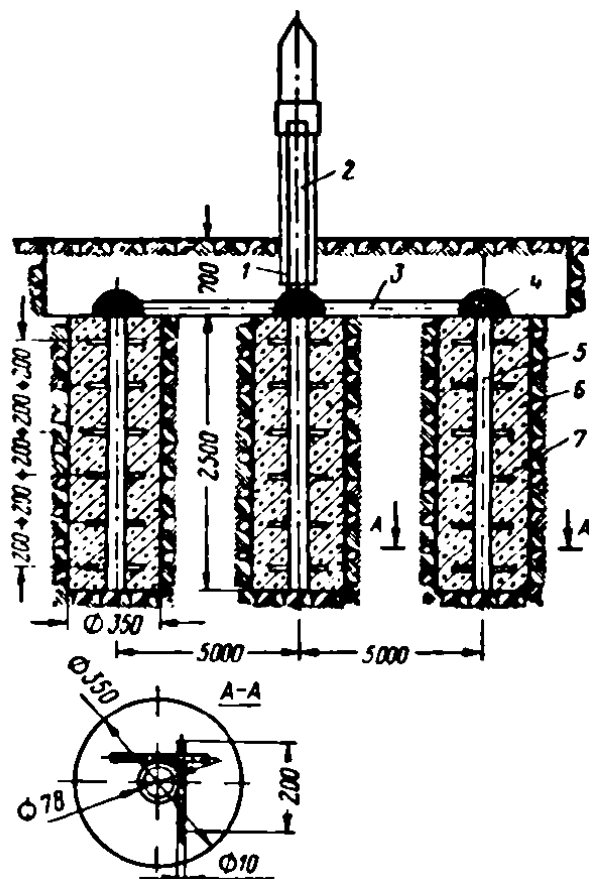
Combined anode ground electrode: 1 - contact output. 2 - reinforced concrete column; 3 - connecting bus; 4 - bituminous filling of the welded joint; 5 - Earthing electrode; 6 - coke concrete; 7 - pins
